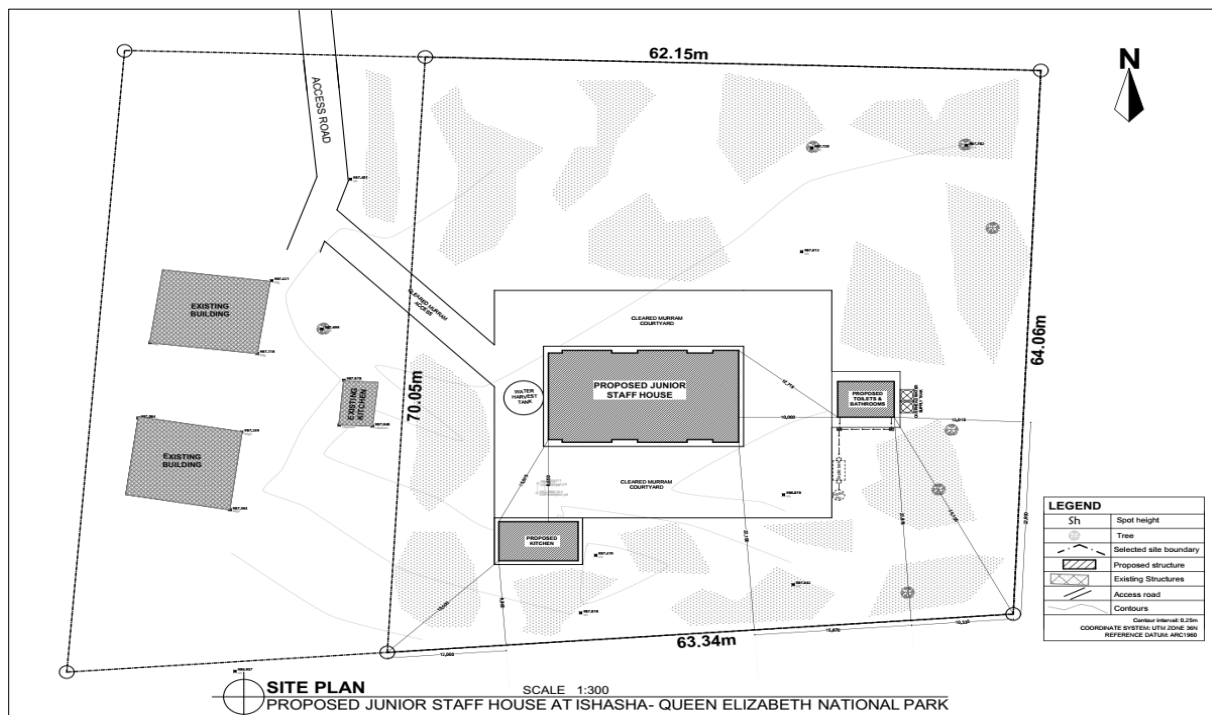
Ishasha Junior Staff Accommodation Site Plan
